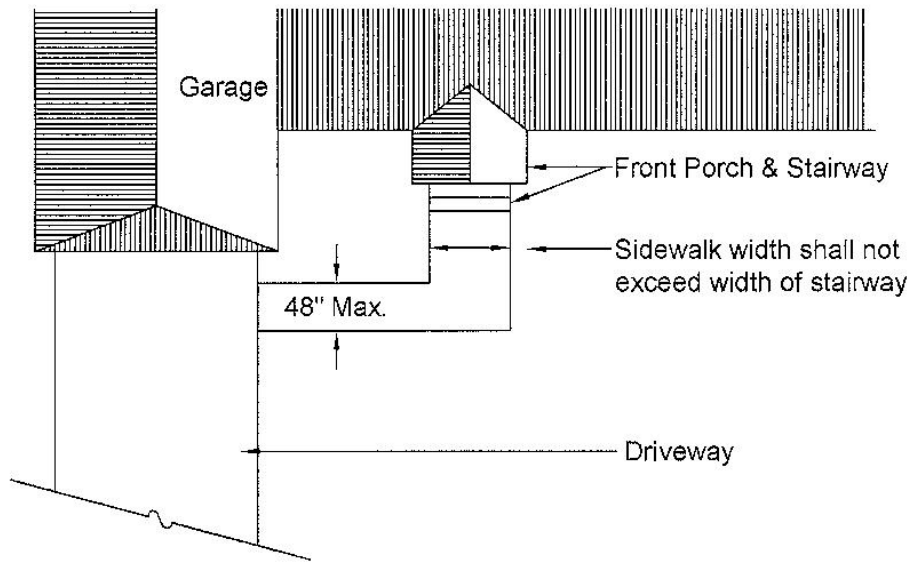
Traditional Straightline Sidewalk/ Walkway Standard (Not to Scale)
